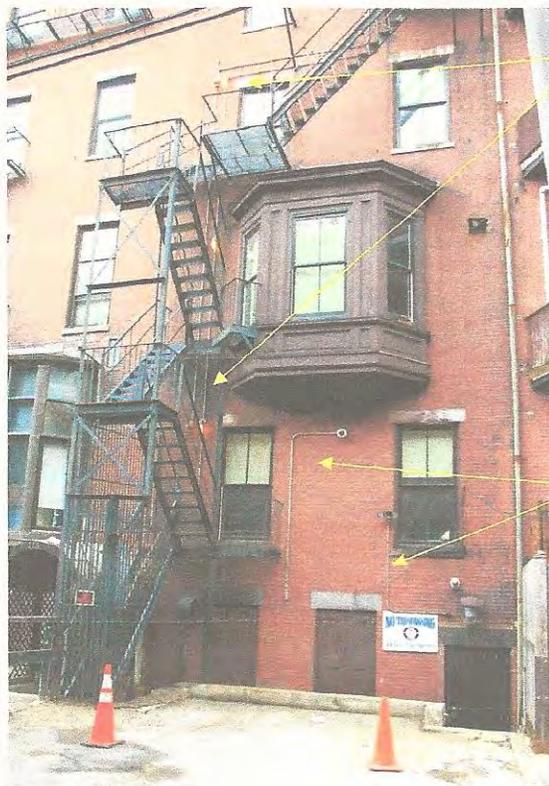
102 - 114 BEACON STREET - UNAPPROVED EXTERNAL MECHANICAL EQUIPMENT
